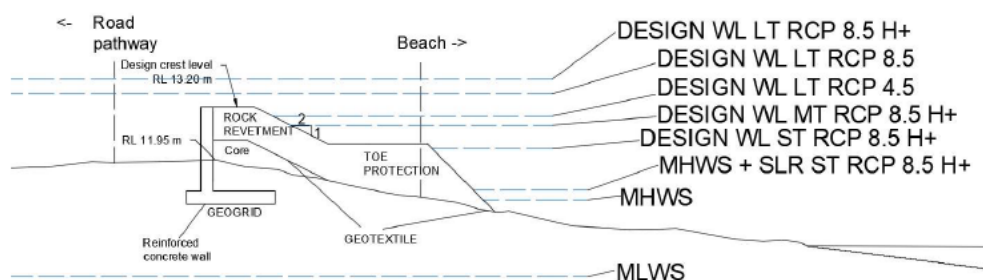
Typical design cross section of cantilevered reinforced concrete wall and revetment (Beya and Asmat, 2020).
